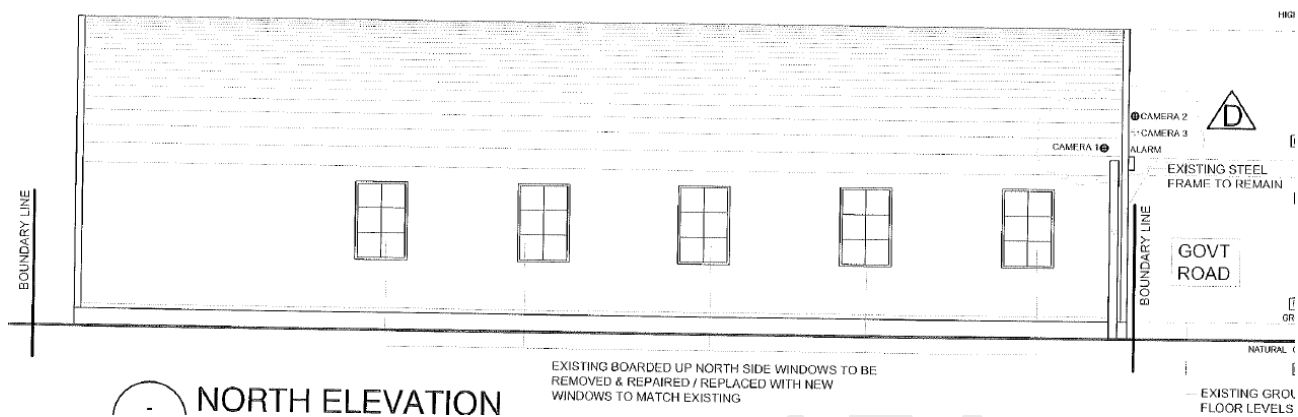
North elevation showing proposed works. Drawing dated 2009 (YCC BP).
